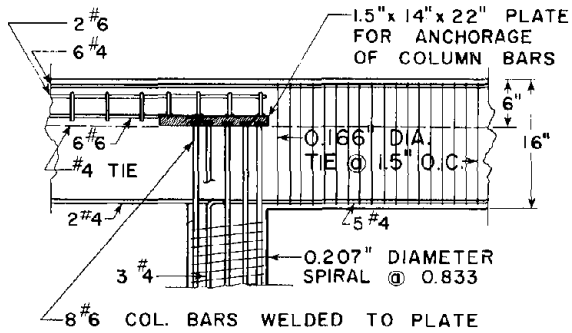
DIMENSIONS AND DETAILING OF THE 4th STORY BEAM OF THE MODEL SUBASSEMBLAGE
